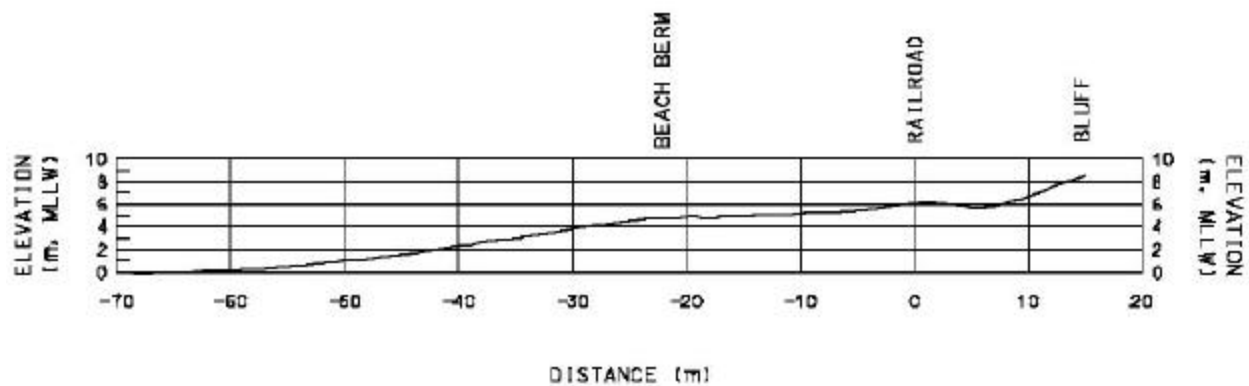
Typical Cross-shore Section for Reach 2, Reach 4, Reach 6, Reach 8 (No Revetment)
